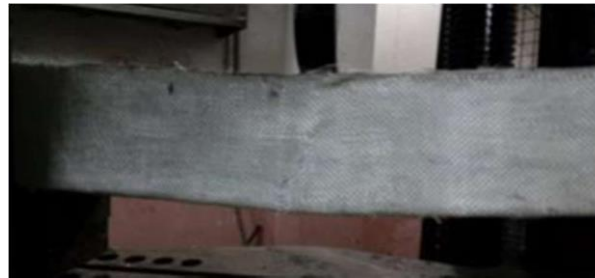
Sample of Glass Fabric Reinforced Concrete Beam
